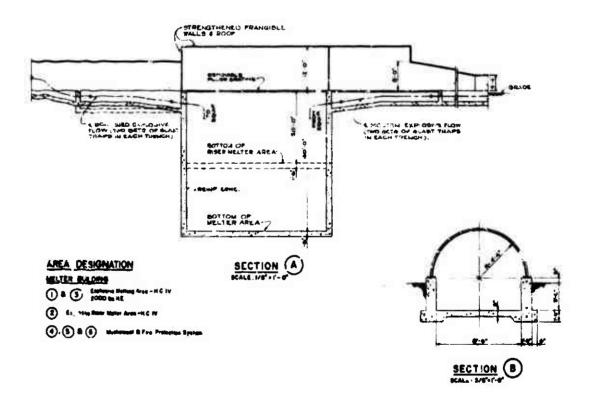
MELTER BUILDING, BLDG'S NC'S 108 & 112
